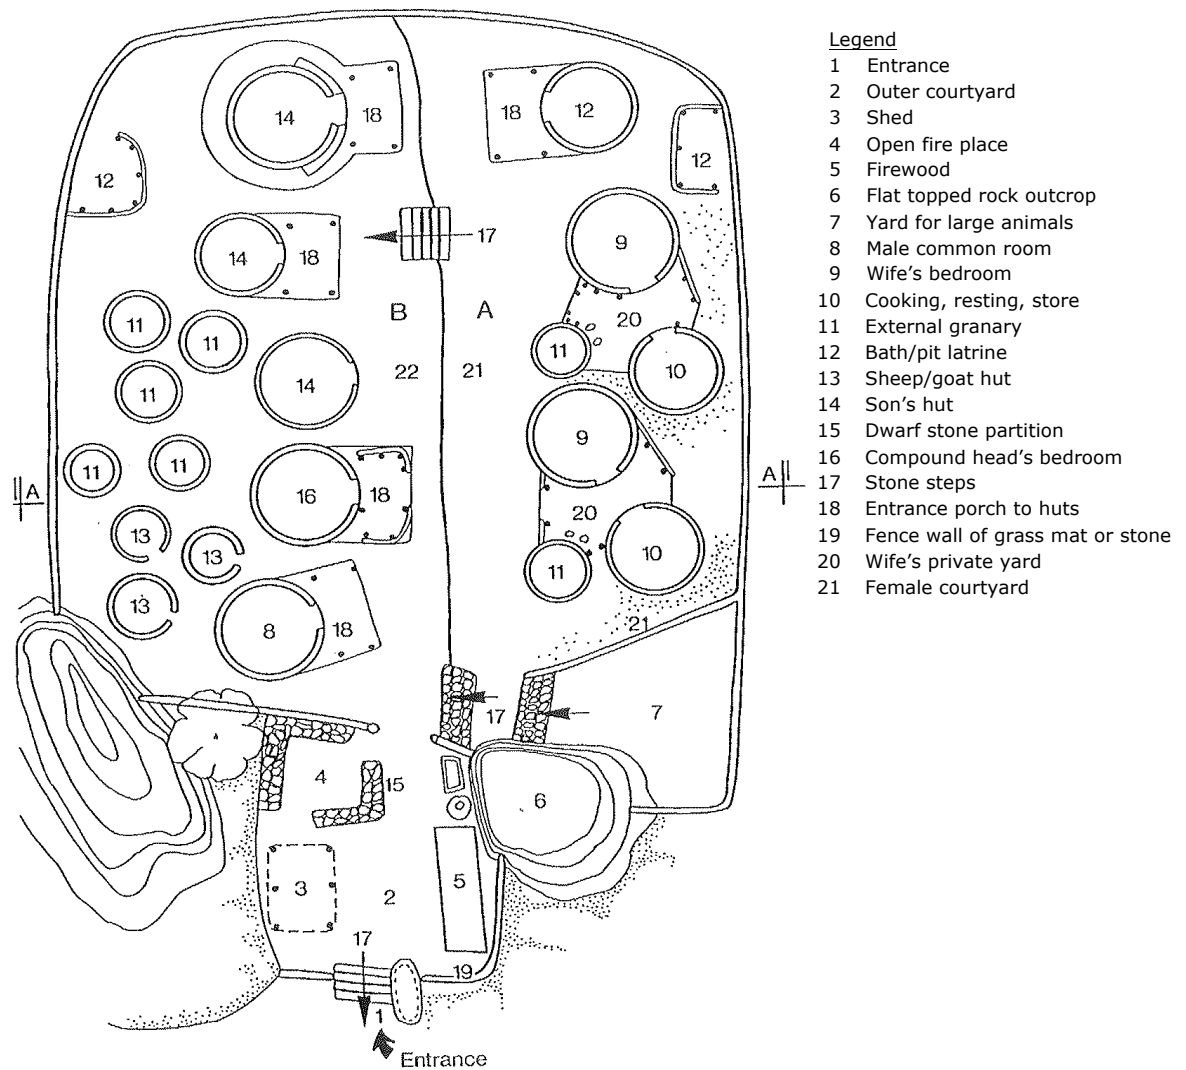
Floor plans of a traditional Higgi dwelling, Mandara highlands (after Kwada 1987). Adapted from Saad (1991)
